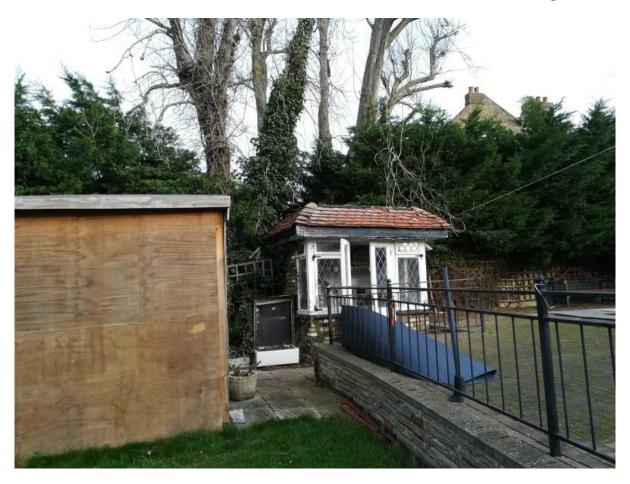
Looking east towards the outbuilding adjacent to the swimming pool, looking towards T1-T4 (centre) as points of reference.
